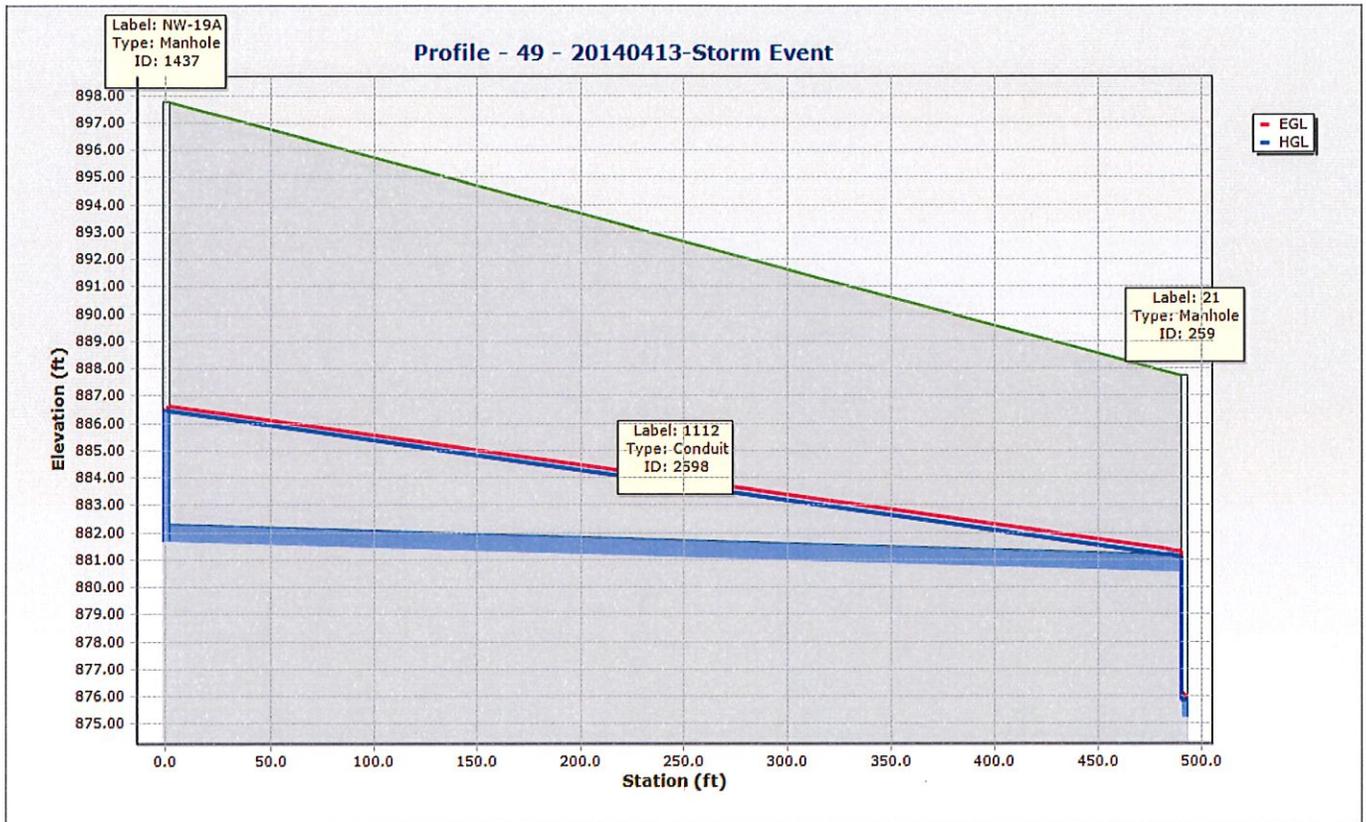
Surcharging Pipe Section, 25-yr, 24-hr Storm
